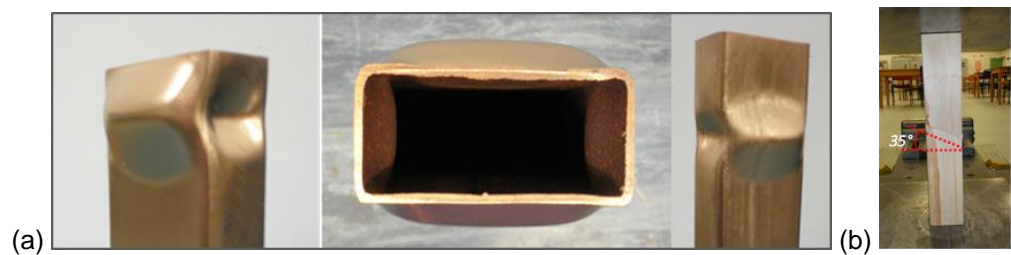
(a) Plastic buckling of the bare steel specimens, (b) failure of the bare timber specimen.
